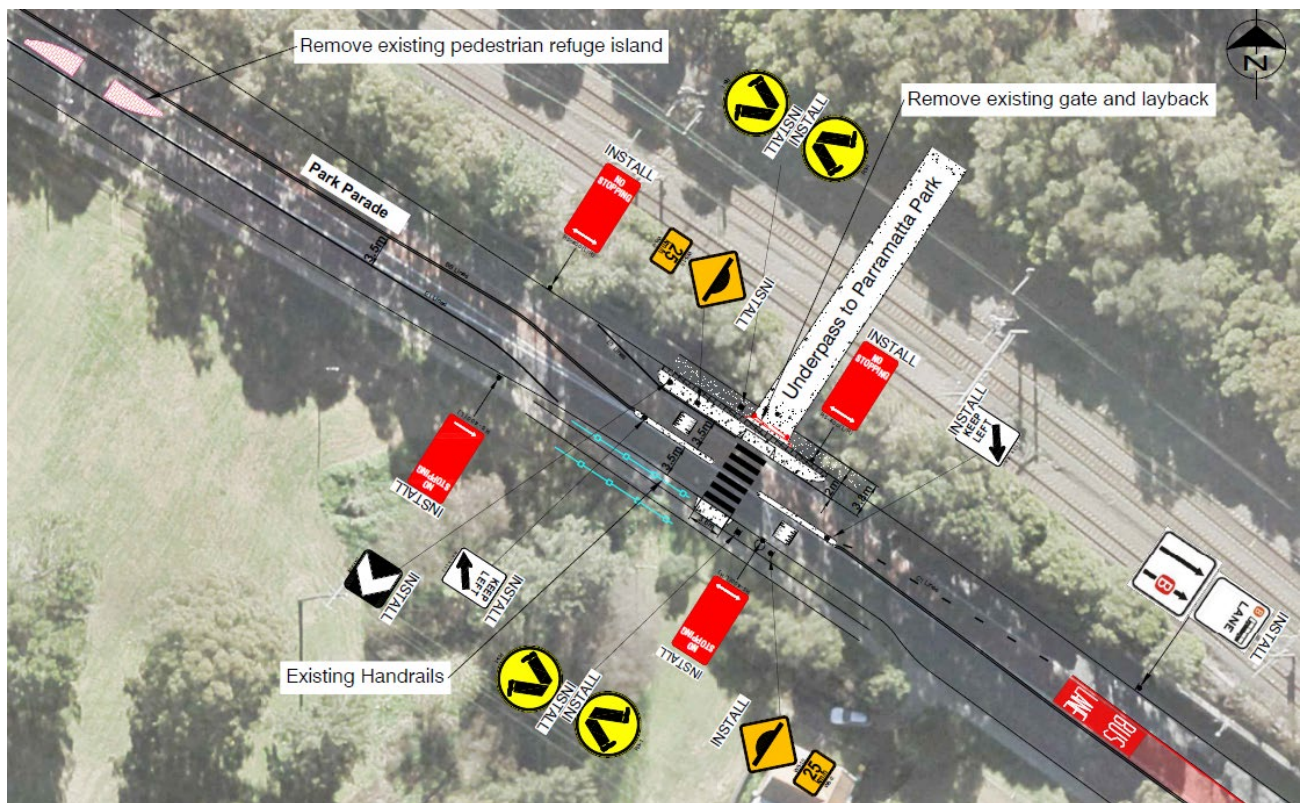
A concept plan showing the proposed pedestrian crossing in Park Parade, Parramatta as well as the existing pedestrian refuge island to be removed.
